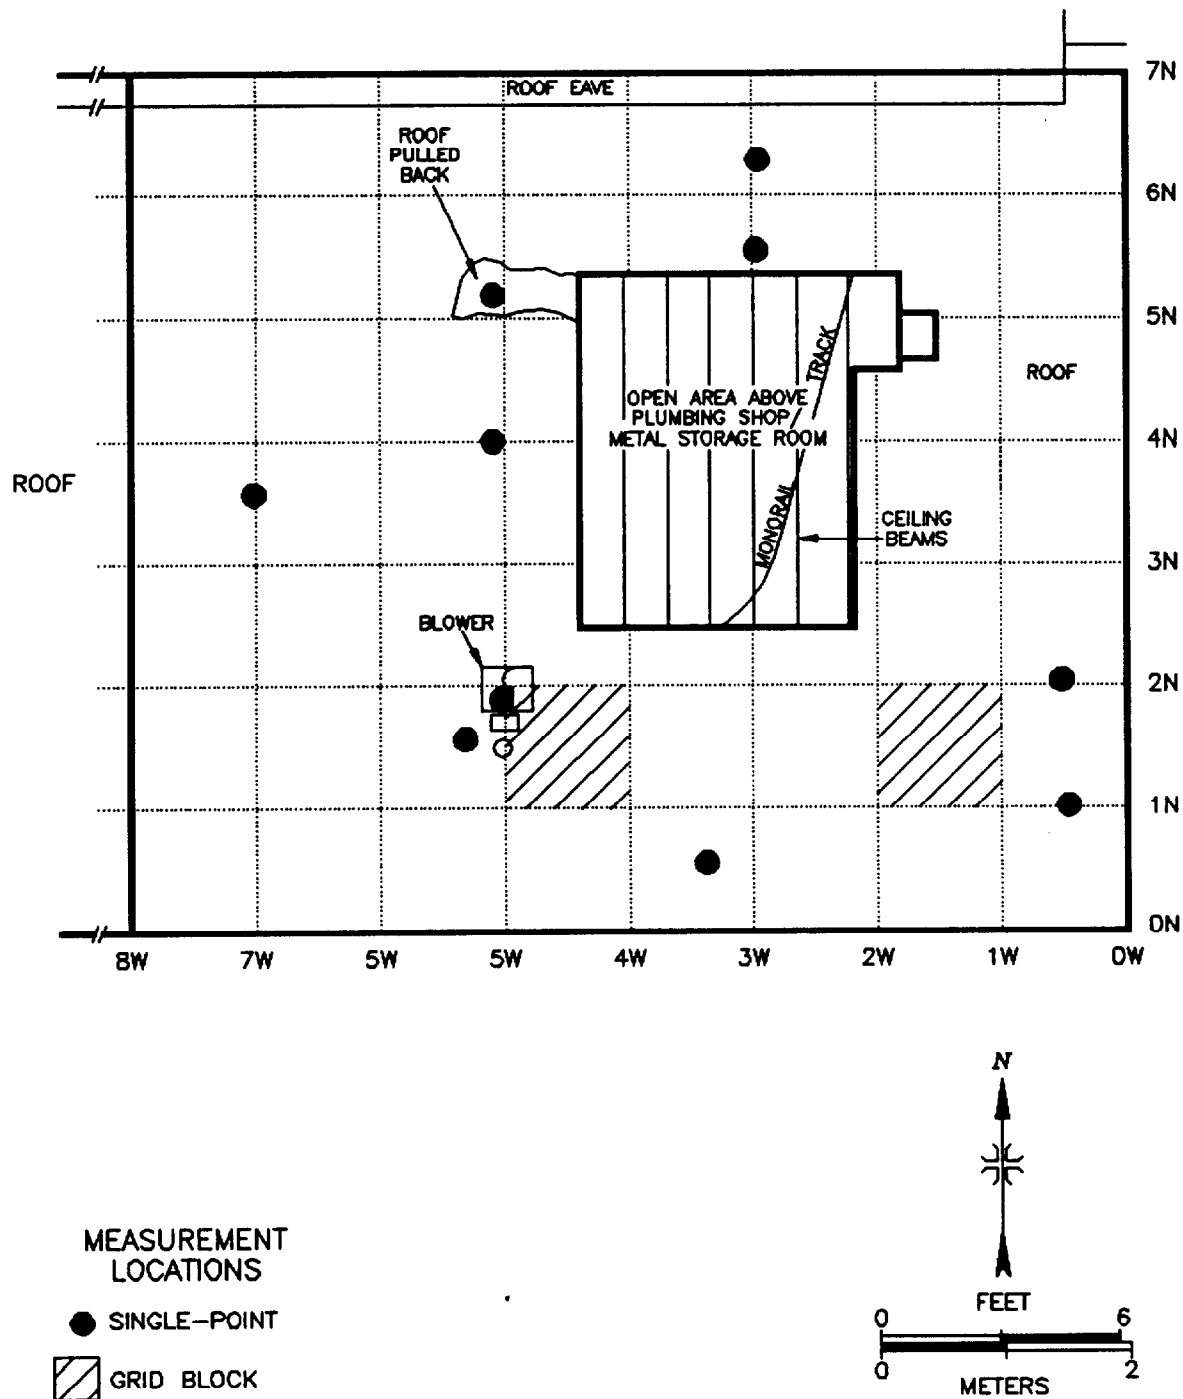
Building 5, Roof, Southeast Corner Above Plumbing Shop/Metal Storage Room – Measurement Locations
